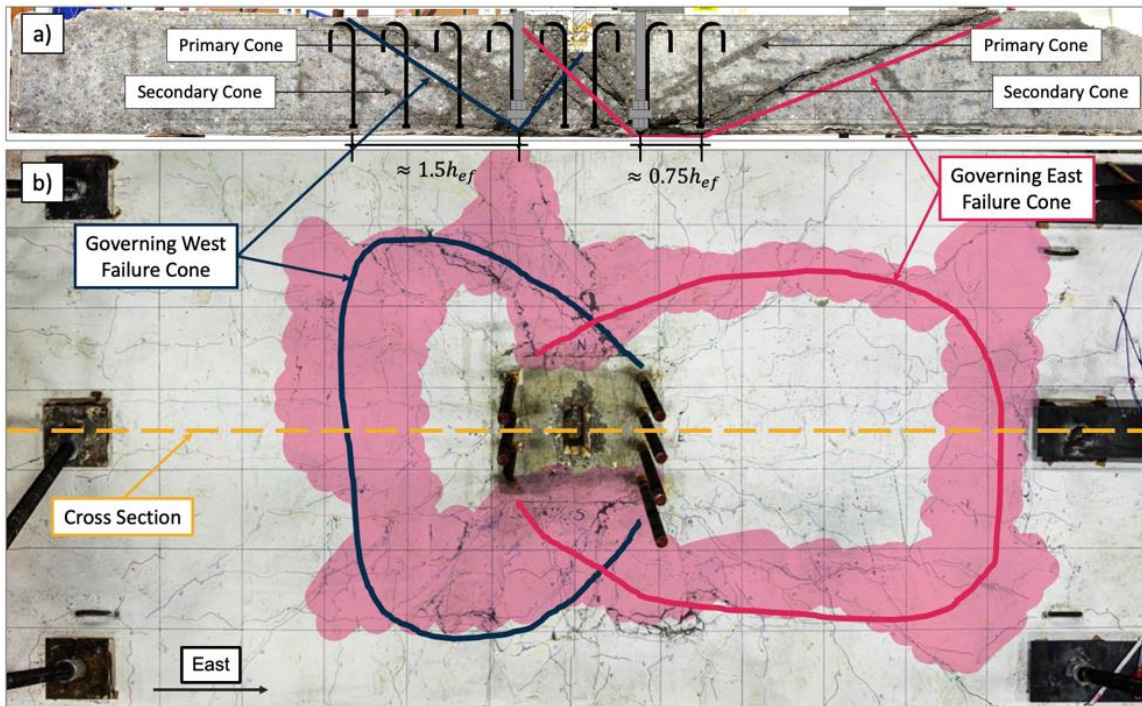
Specimen M02 crack patterns in (a) cross section and (b) plan view highlighting the breakout cones. The shaded region produced a hollow sound when tapped. [1]
